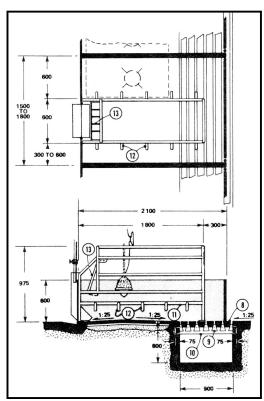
Side creep farrowing pen with part-slotted floor. Reinforced concrete slats 8 spaced 25 mm apart with plywood spacer cleats 9 nailed to 10 38 x 140 mm pressure treated wood beams set 75 mm into concrete. Sow retainer bar 11 has welded pipe fingers 12 at 45°. Steel pipe crate has adjustable swinging front head gate 13 to help sow keep manure to rear of stall.
